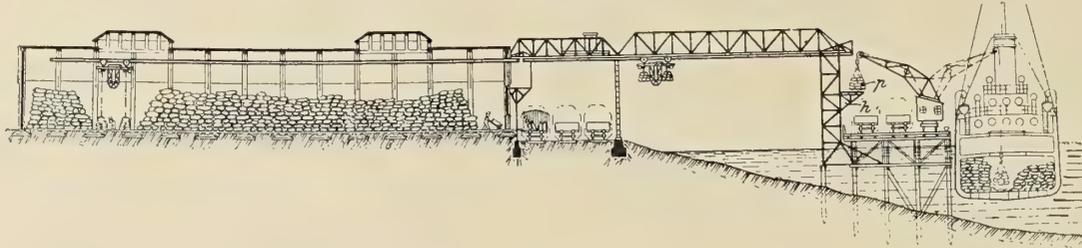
SECTION OF PIER AND STOREHOUSES THROUGH B, FIG. 2
